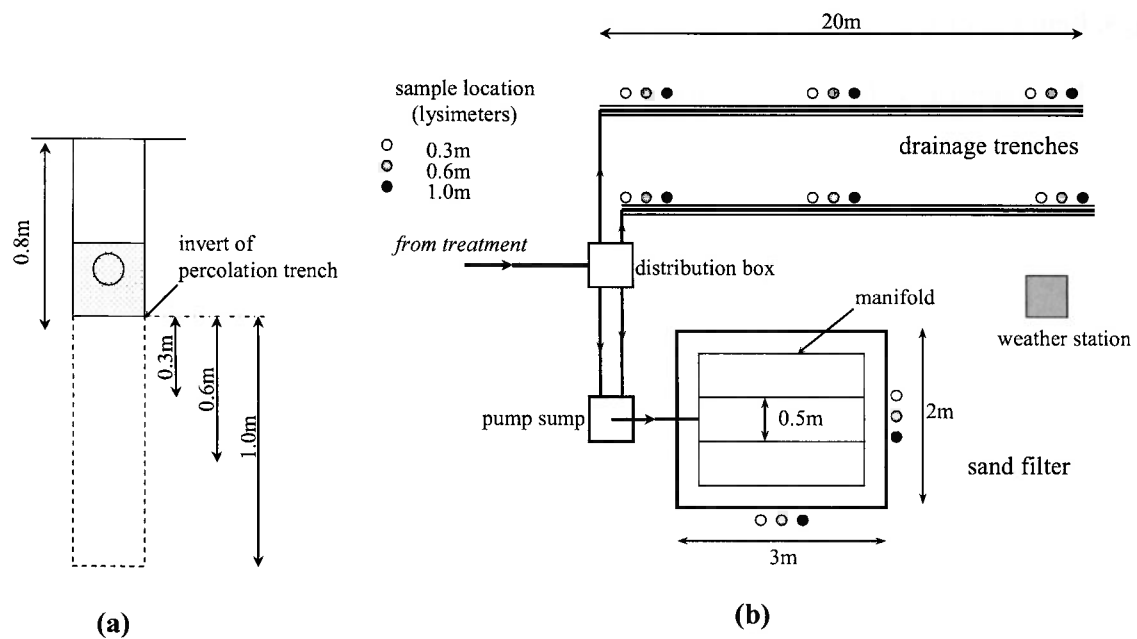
Site layout: (a) Cross-section and depths of instrumentation (b) Plan view of trenches and stratified sand filter (*not to scale*).
